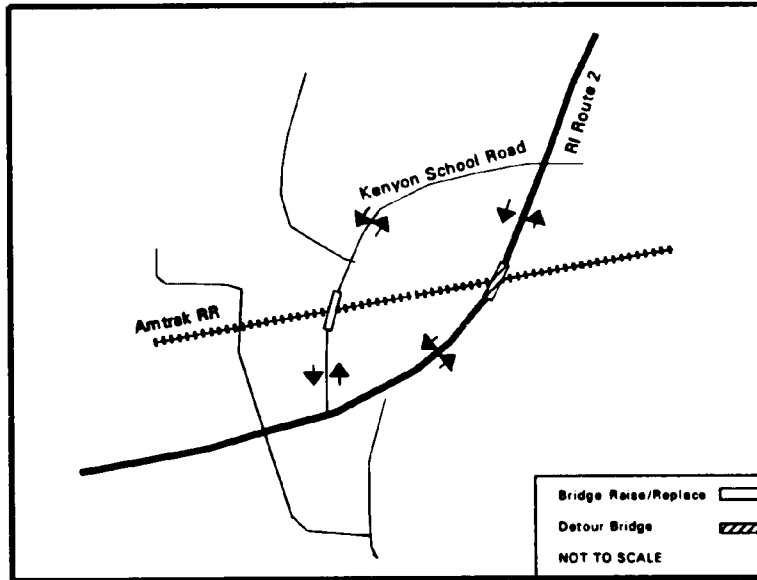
KENYON SCHOOL ROAD DETOUR
